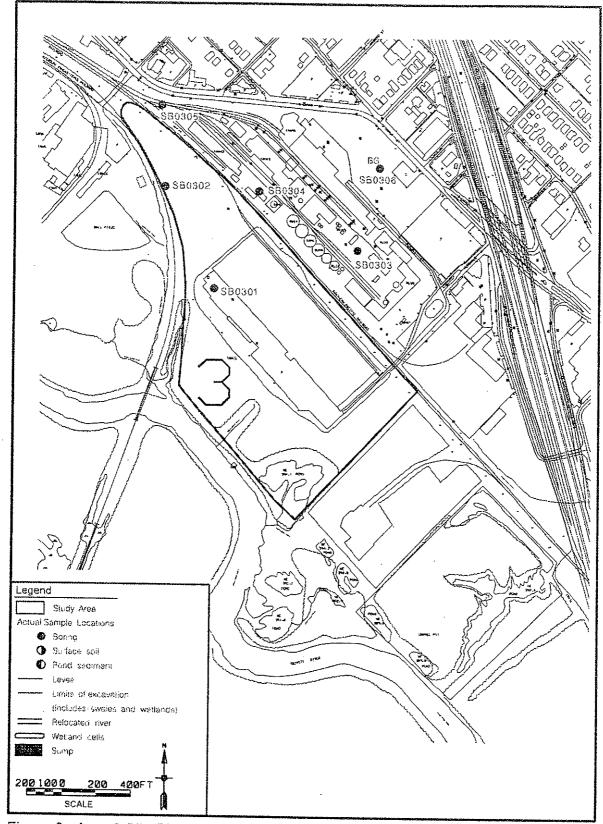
Area 3 Site Plan with Actual Sampling Location and Construction Elements.
